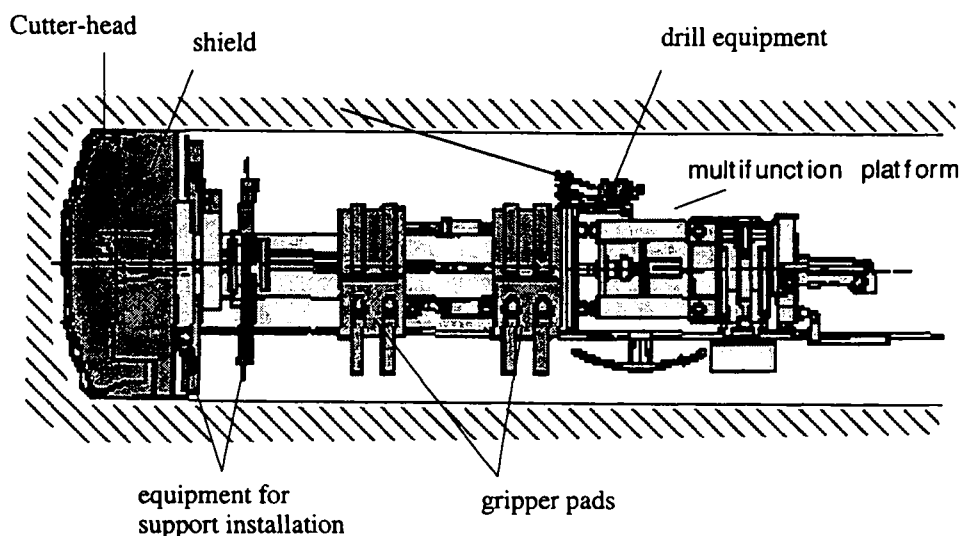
Simplified scheme of a shielded hard rock tunnel boring machine. Depending on rock quality, the tunnel lining (e.g. steel sets, shotcrete, precast concrete segments) is installed directly behind the TBM-head (see e.g. Cleuson-Dixence - unit C) or further behind on the working platform (Cleuson-Dixence - unit B).
